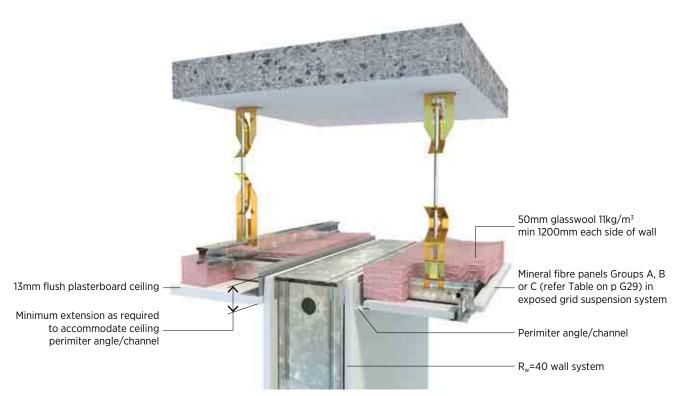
Ceiling configuration to maintain an  $R_w$ =40 wall acoustic rating (System OP.5 shown)
